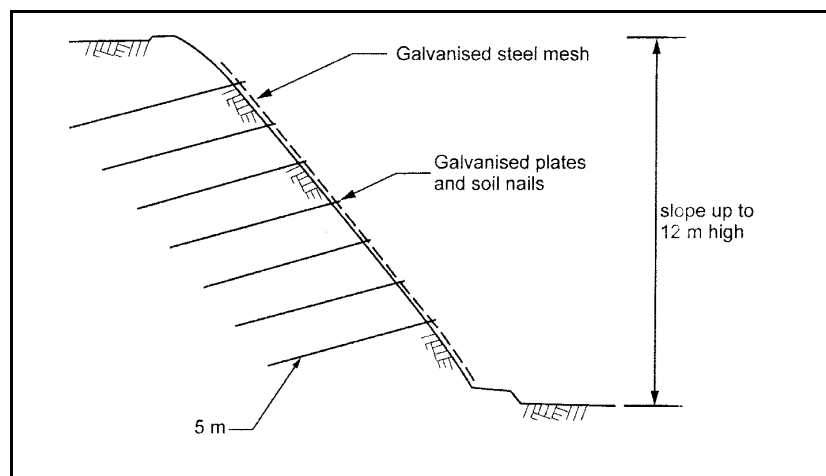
A natural slope in Wales, stabilized with soil nails (Barley, 1992)
